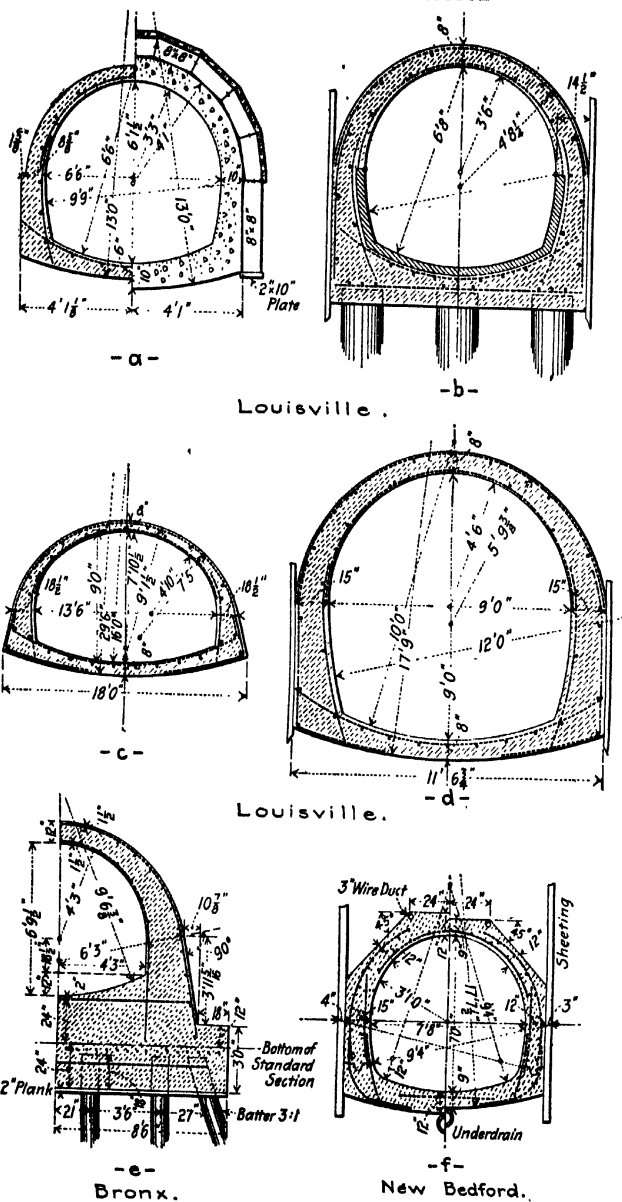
Louisville, Ky., 34th Street Outlet Sewer, 1909, J. B. F. Breed, Chief Eng. Horse-shoe section, 7 ft.  $\times$  6 ft. 8 in. Maximum cover, about 25 ft.; average, about 10 ft. Excavation largely in sand, gravel and clayey loam with some loose rocks. Transverse reinforcing bars, 1/2 in. round, 9 in. on centers; longitudinal bars, 5/8 in. round, spaced as shown. Interior of sewer below springing line lined with vitrified brick. Structure built for considerable distance on Simplex concrete piles.
